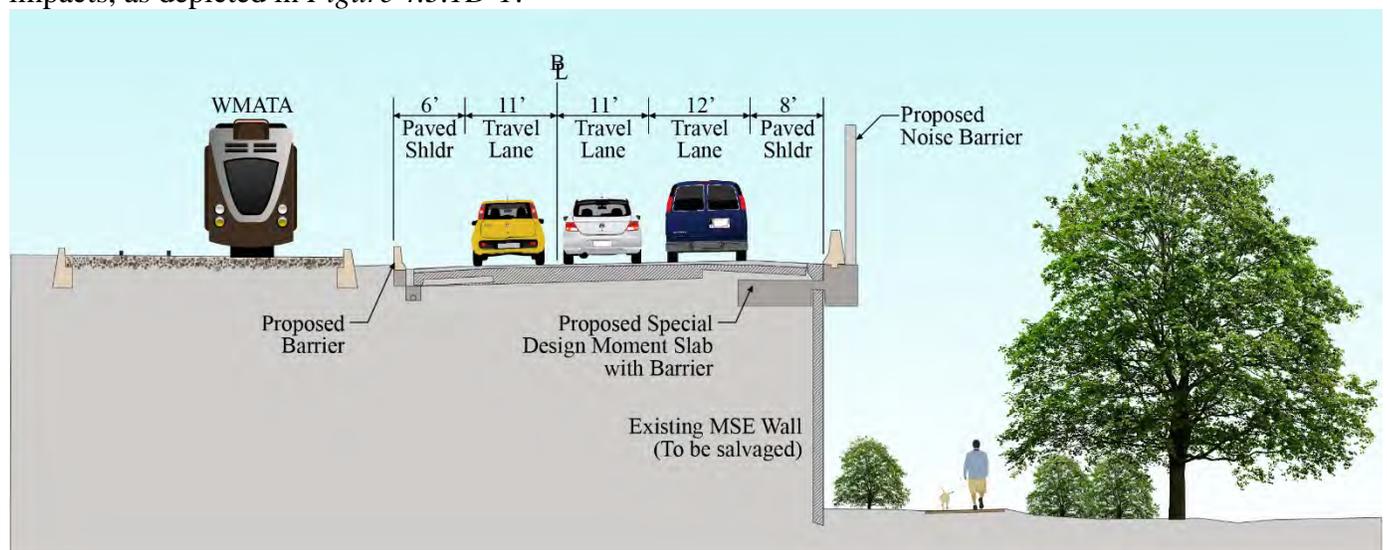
D-1: Existing retaining wall adjacent to Custis Trail.
